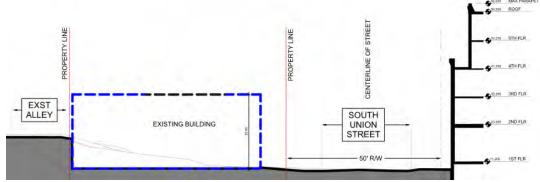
East-west section through site indicating elevation difference between alley and South Union Street
